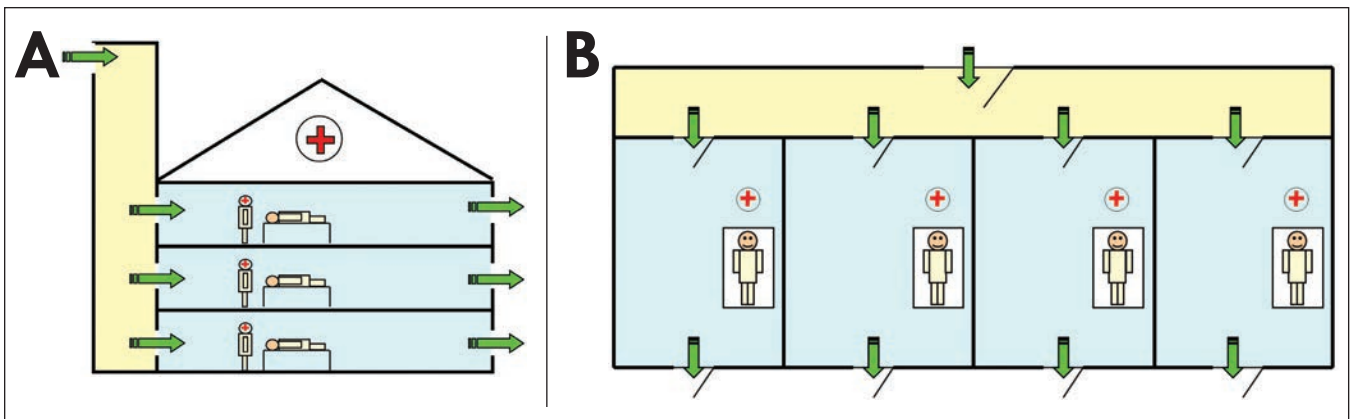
Wind-driven natural ventilation in the wind catcher type hospital. A) Section plan; B) floor plan.²
